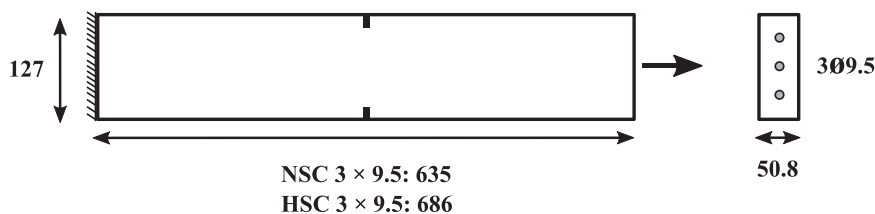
Geometric, loading and reinforcement layout of reinforced concrete beams NSC 3 × 9.5 and HSC 3 × 9.5. Dimensions in mm.
